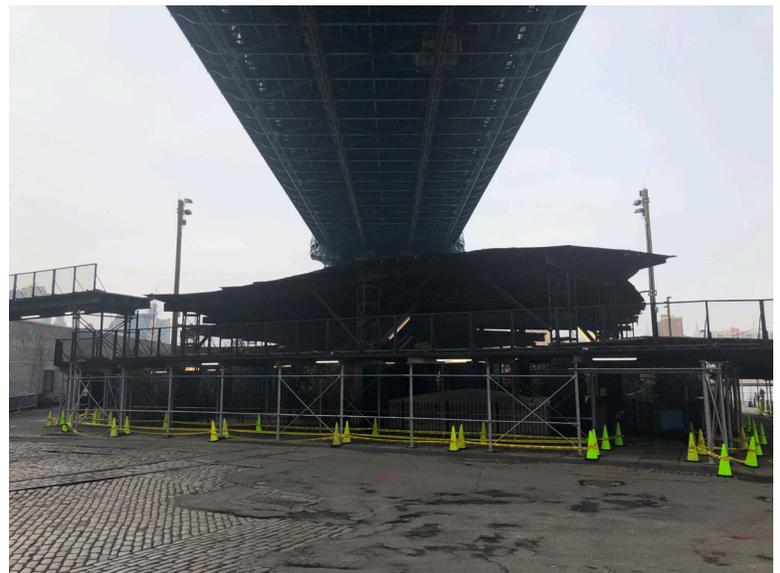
Photo of site looking north underneath the Manhattan Bridge.
